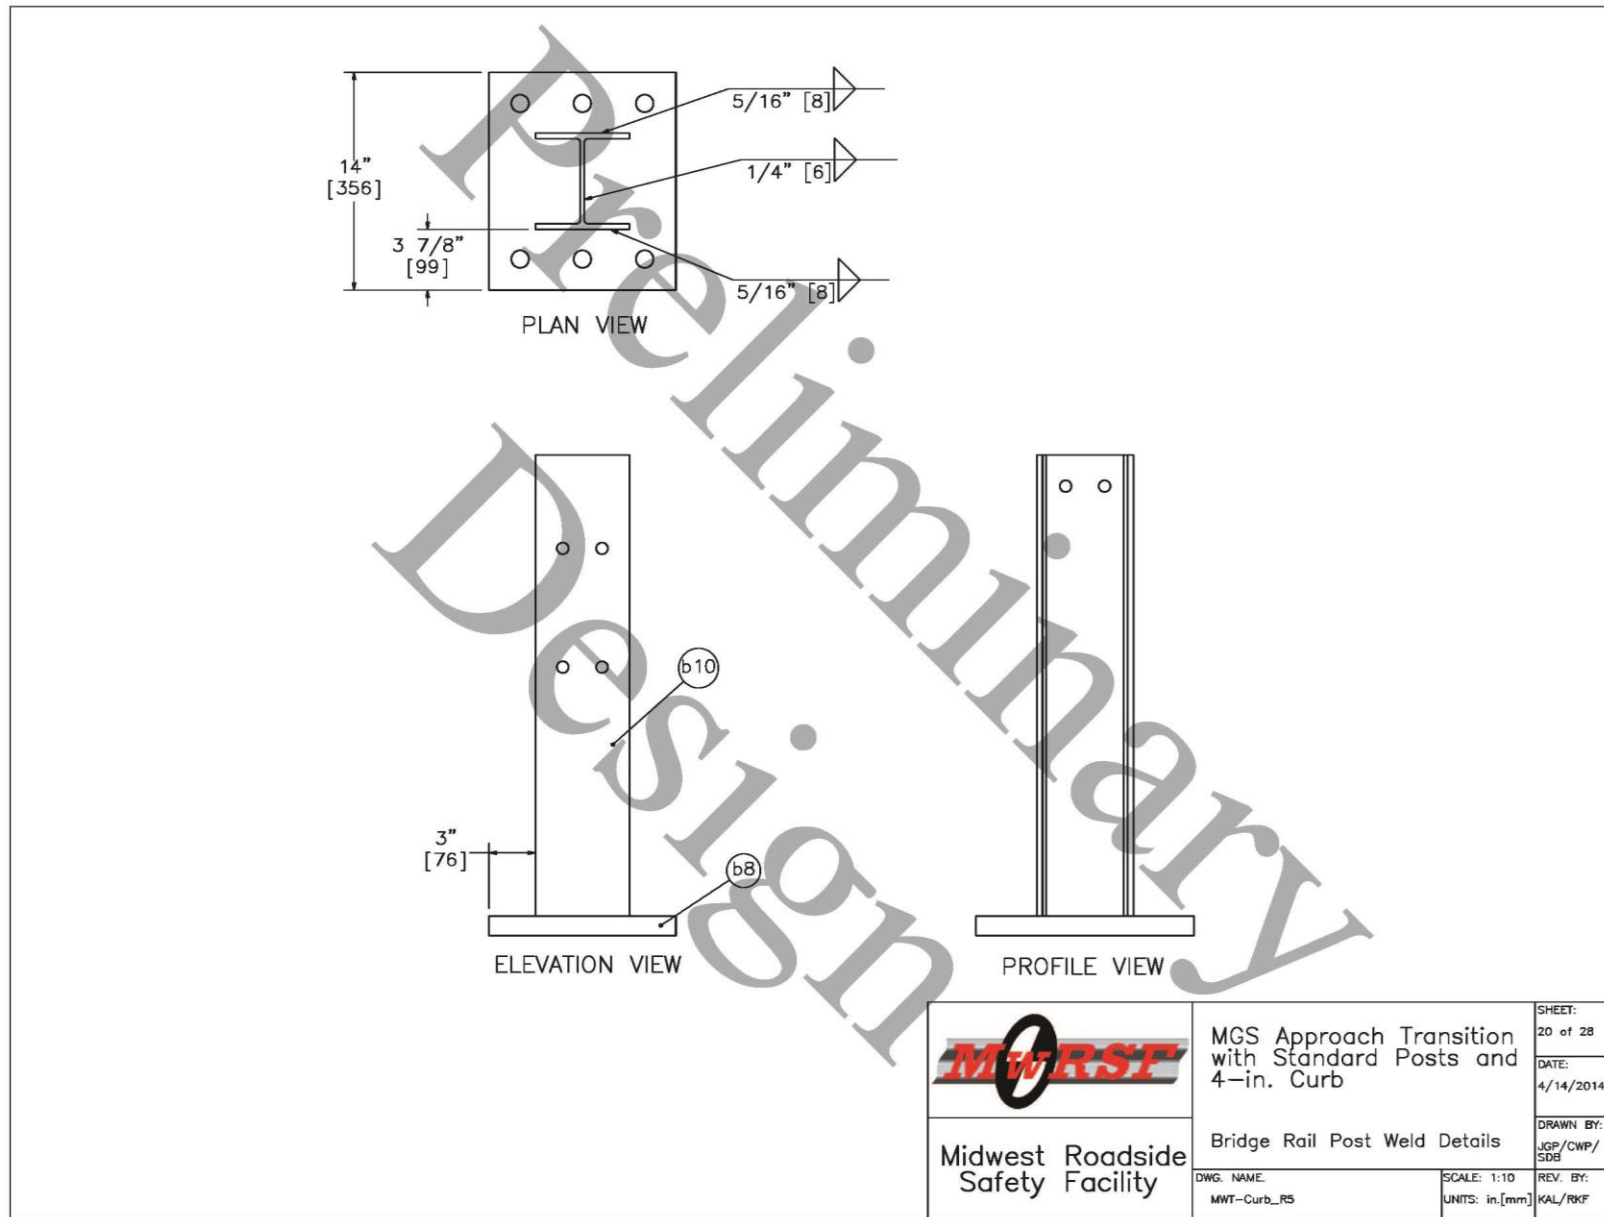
Bridge Rail Post Weld Details, Test No. MWTC-1
